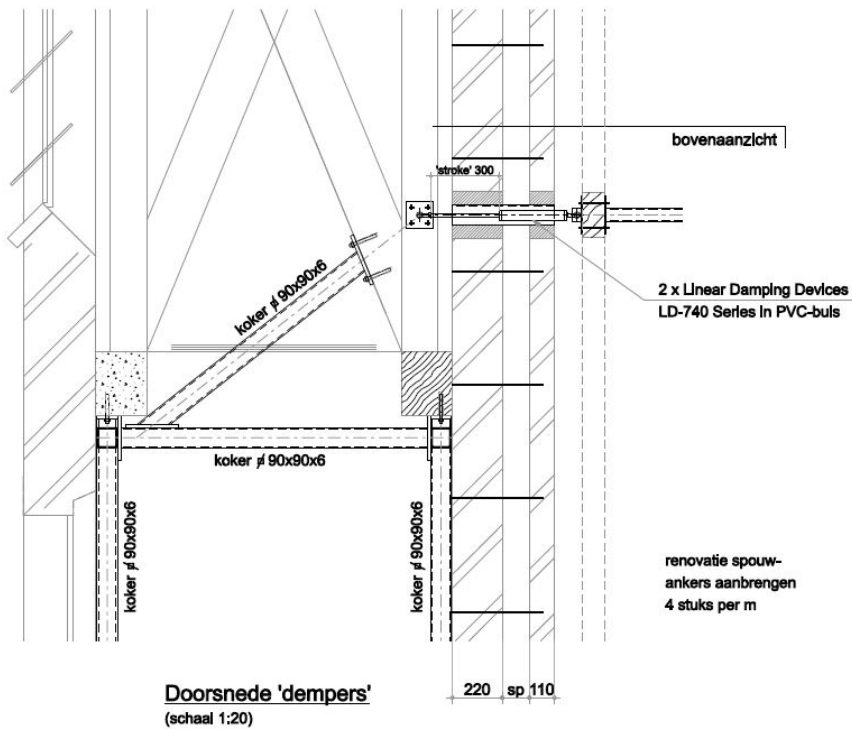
Cross-sectional details of steel frame in Bell-tower
